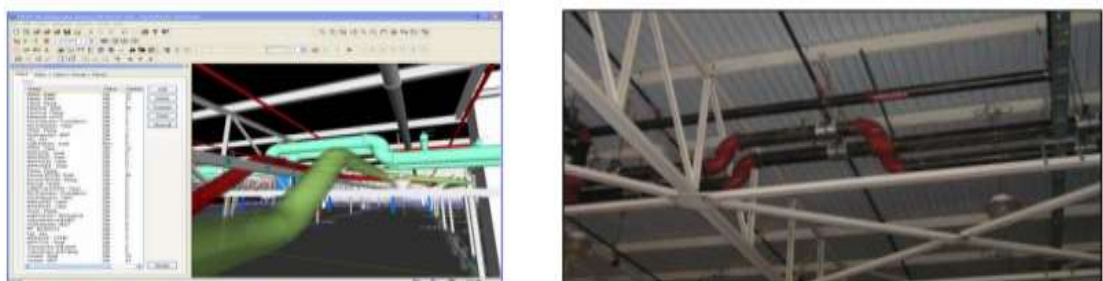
A Virtual Drawing And Set Of Construction/Installation Details.
